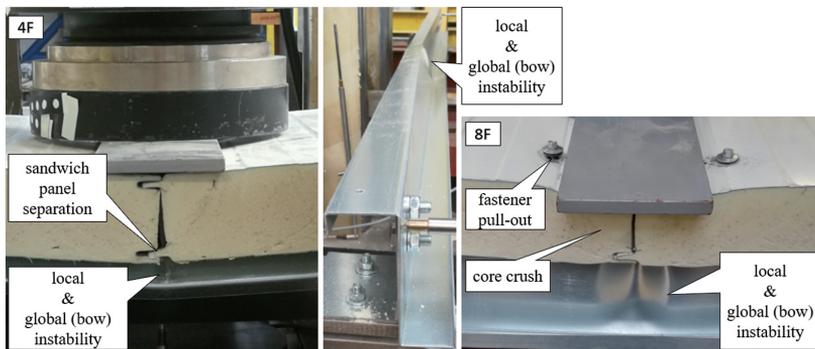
The failure mechanism of the load type  $P$  with four and eight fasteners
